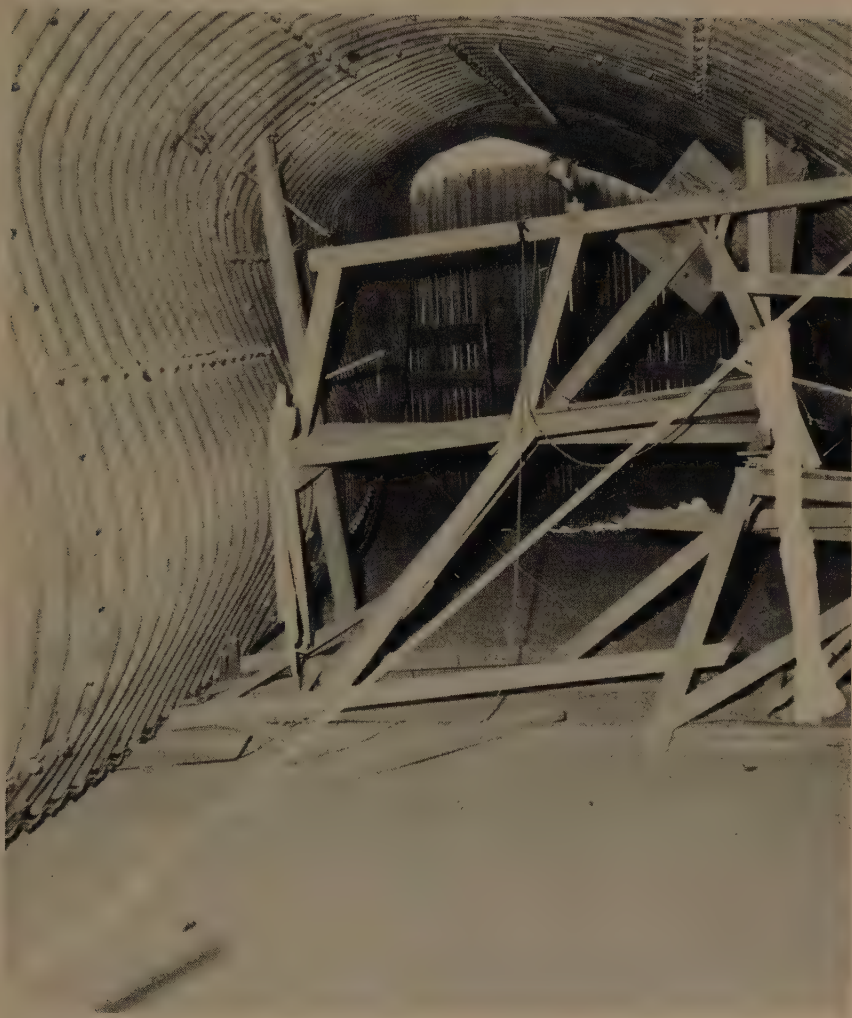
Severe damage to earth-covered surface corrugated steel structure.
